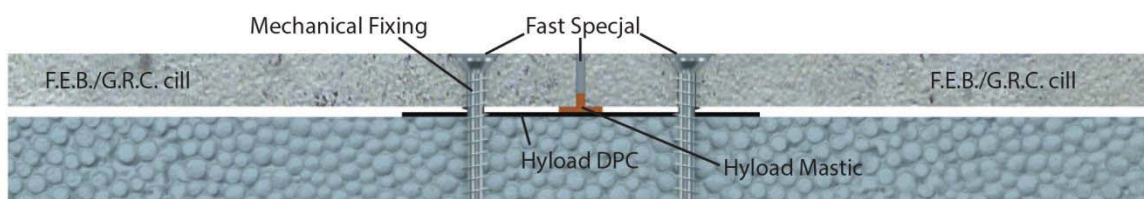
F.E.B. G.R.C EcoCill - Section through typical FEB EIFS.
